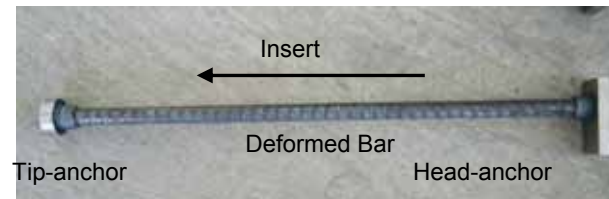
Deformed Bar with Anchors for Shear Reinforcement
